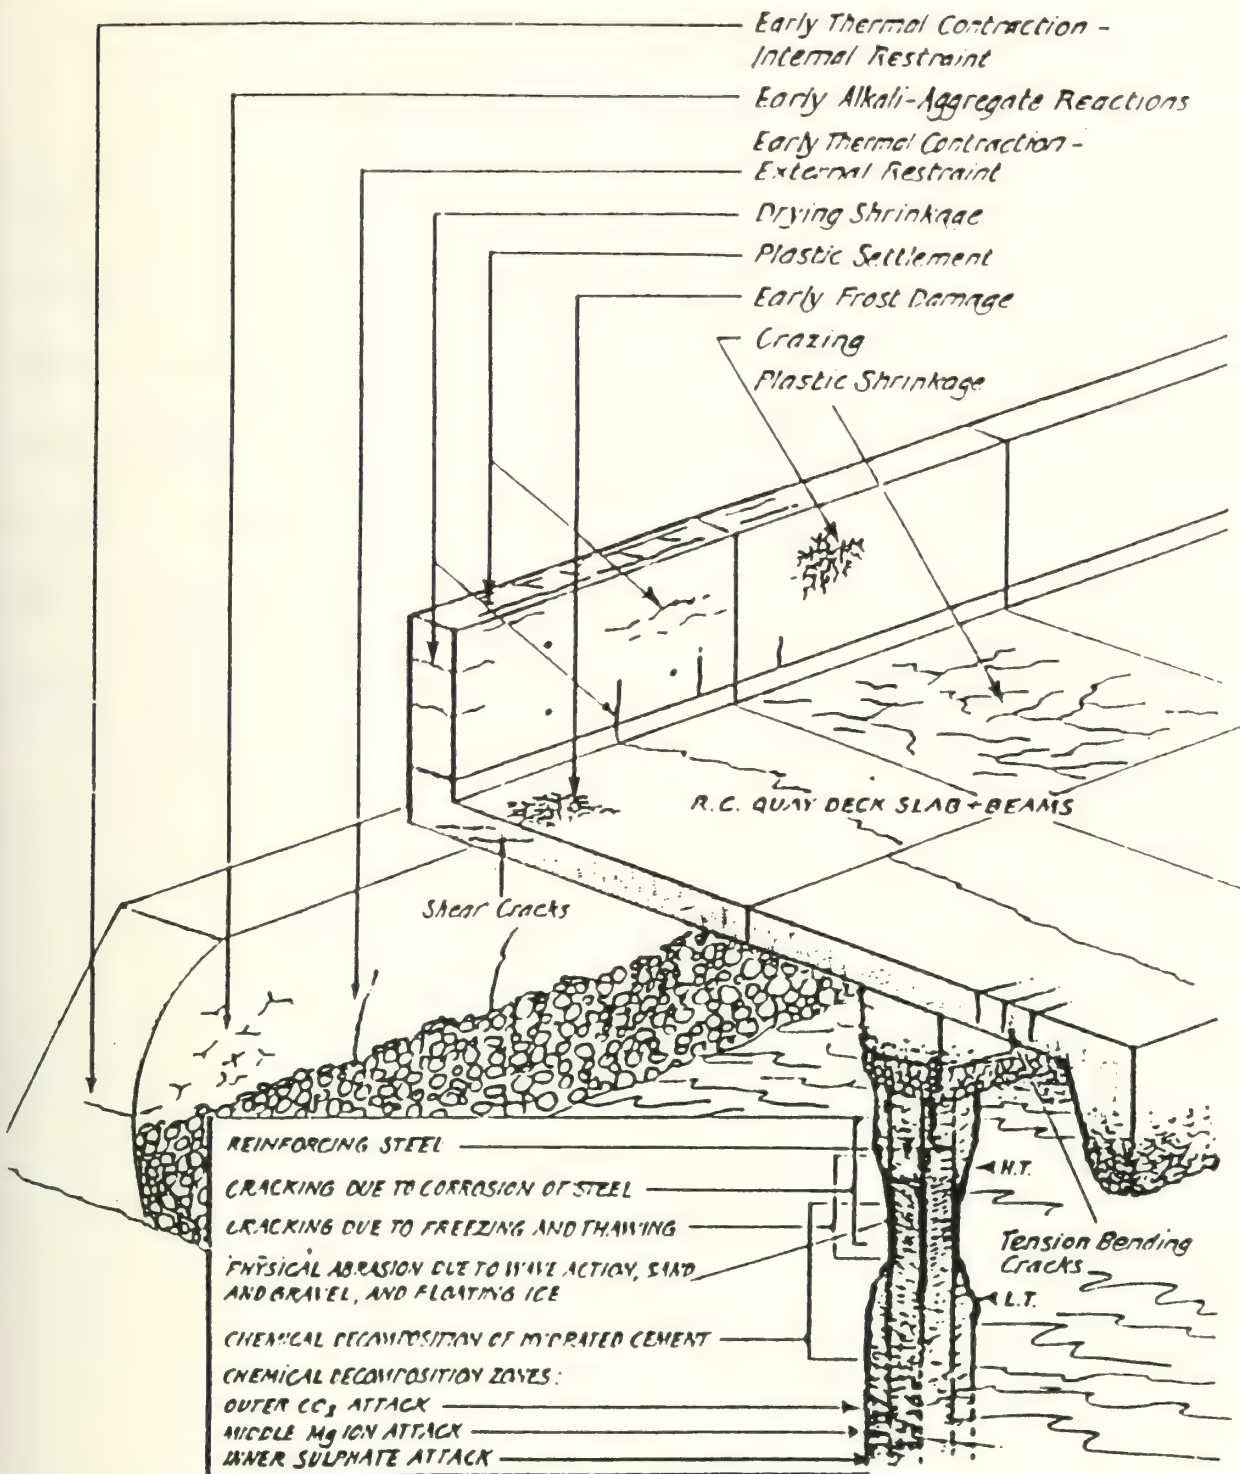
Summary of Deterioration Modes of Concrete Structures in Seawater
